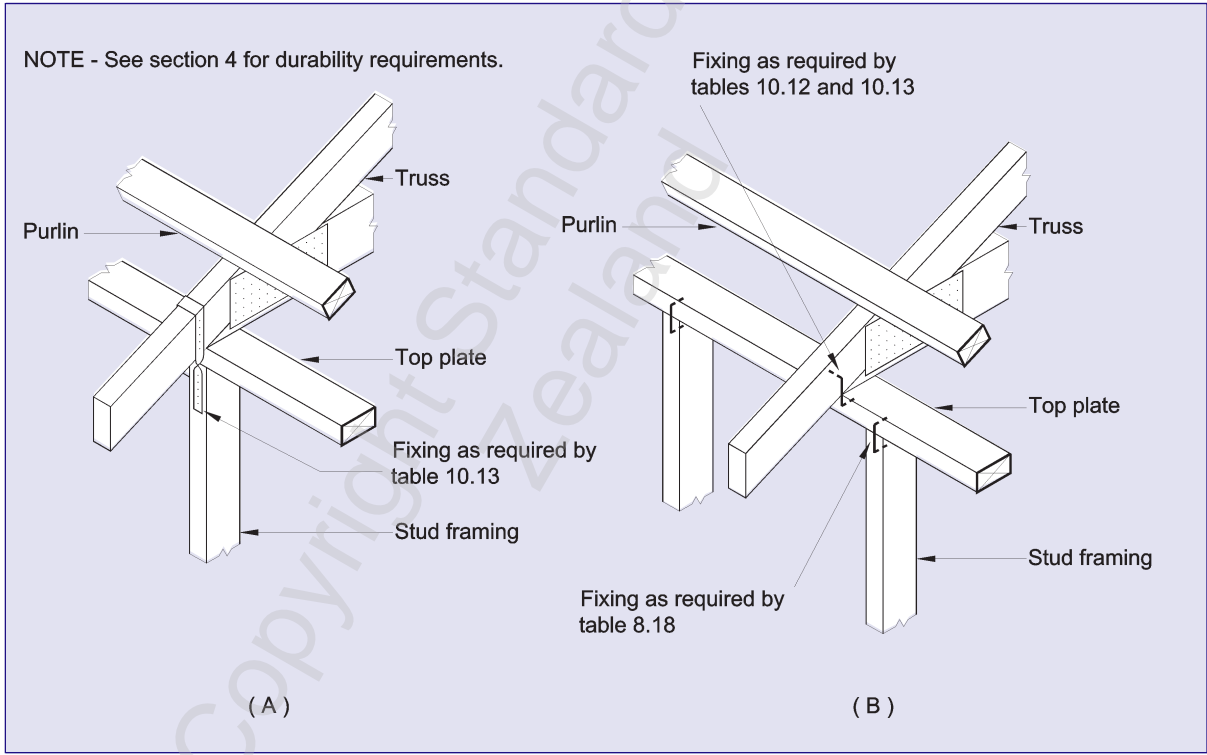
Truss/top plate connections (see 10.2.2.6)
